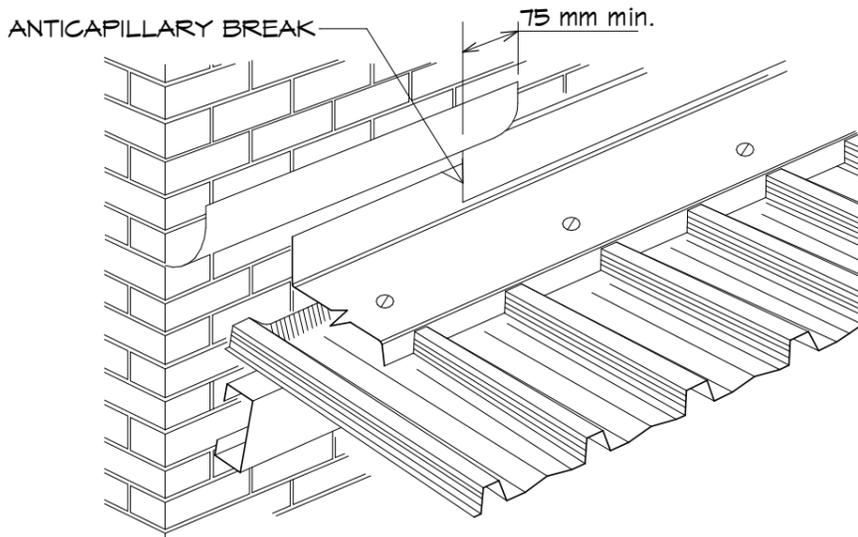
PARAPET AND END WALL FLASHING ACCEPTABLE FLASHING DETAILS
